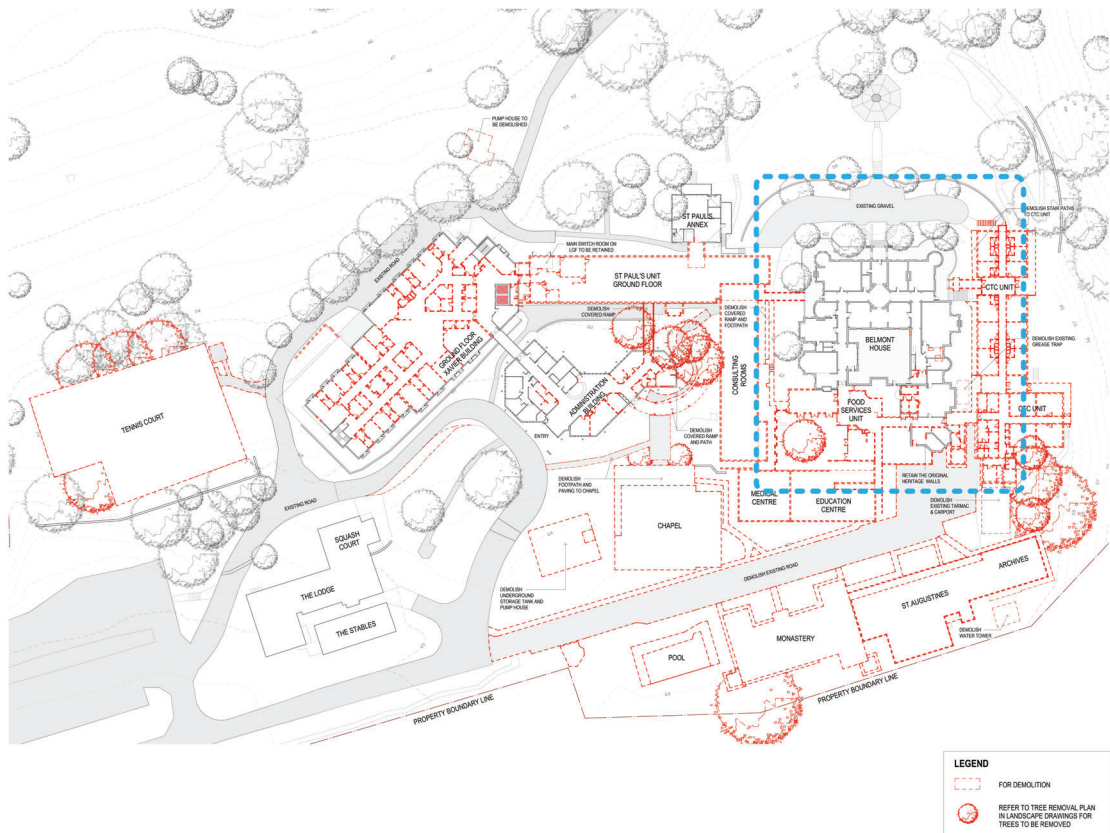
St John of God Richmond Hospital. Proposed Demolition Plan for SSDA 10394. STH October 2021. Belmont House outlined in blue
